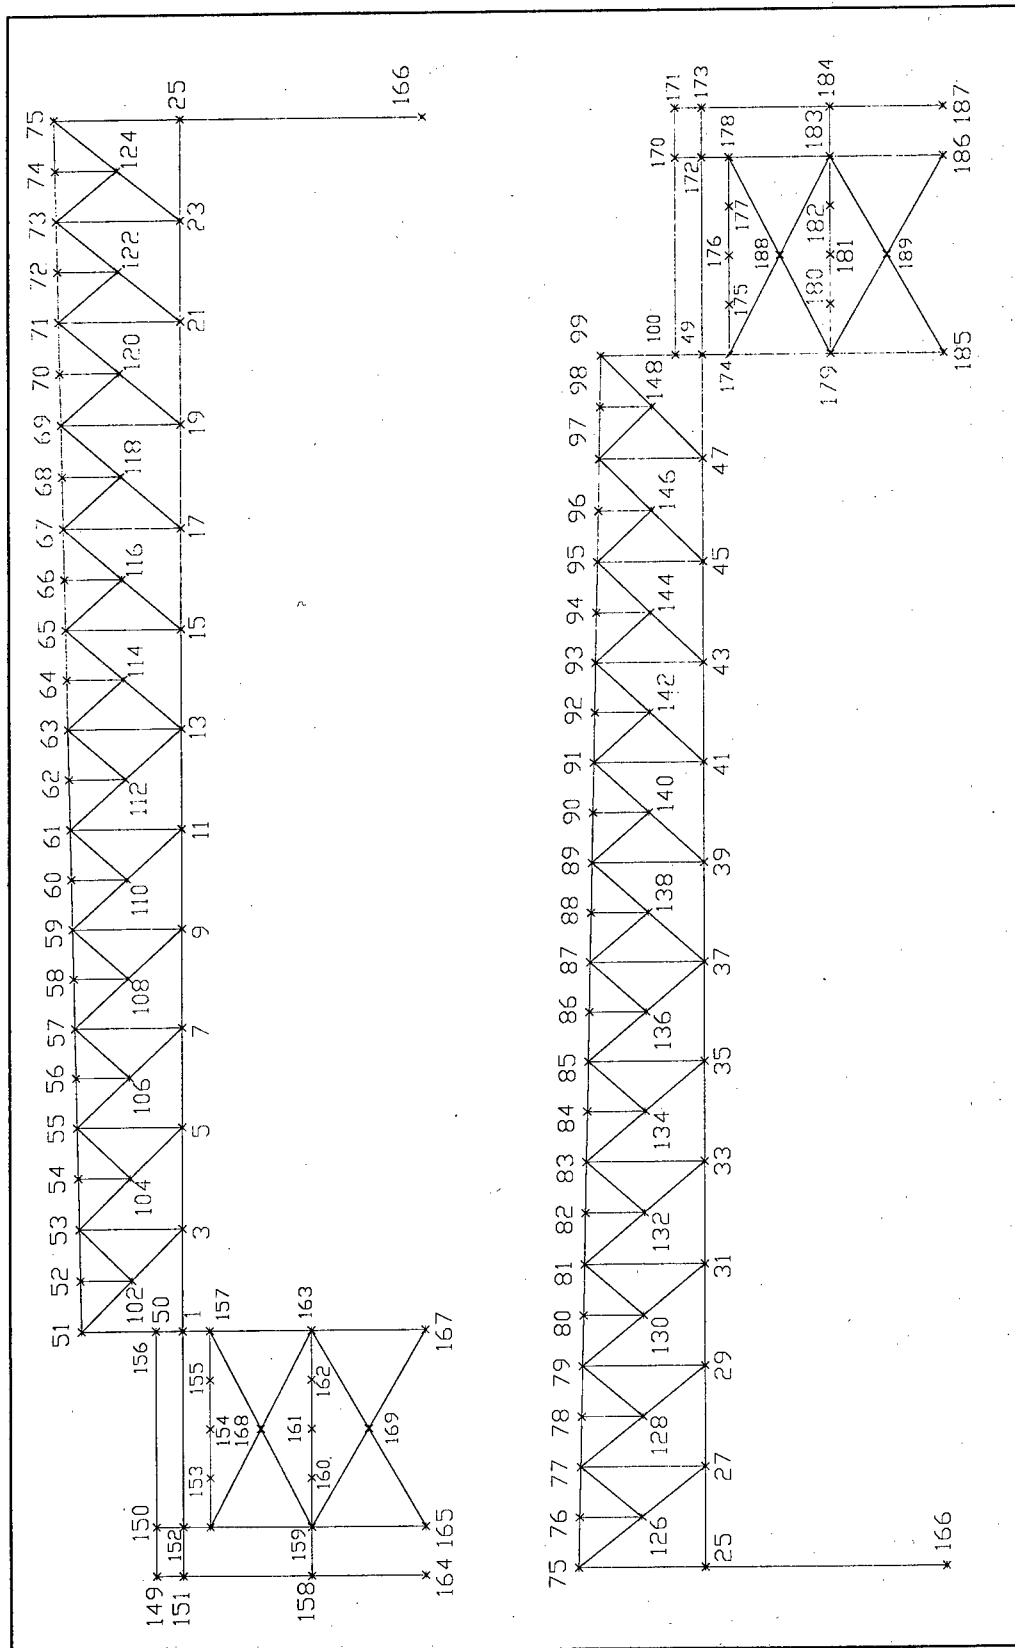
CCAD, TX, joint numbers for Truss T2, Hangars 43 and 47.
